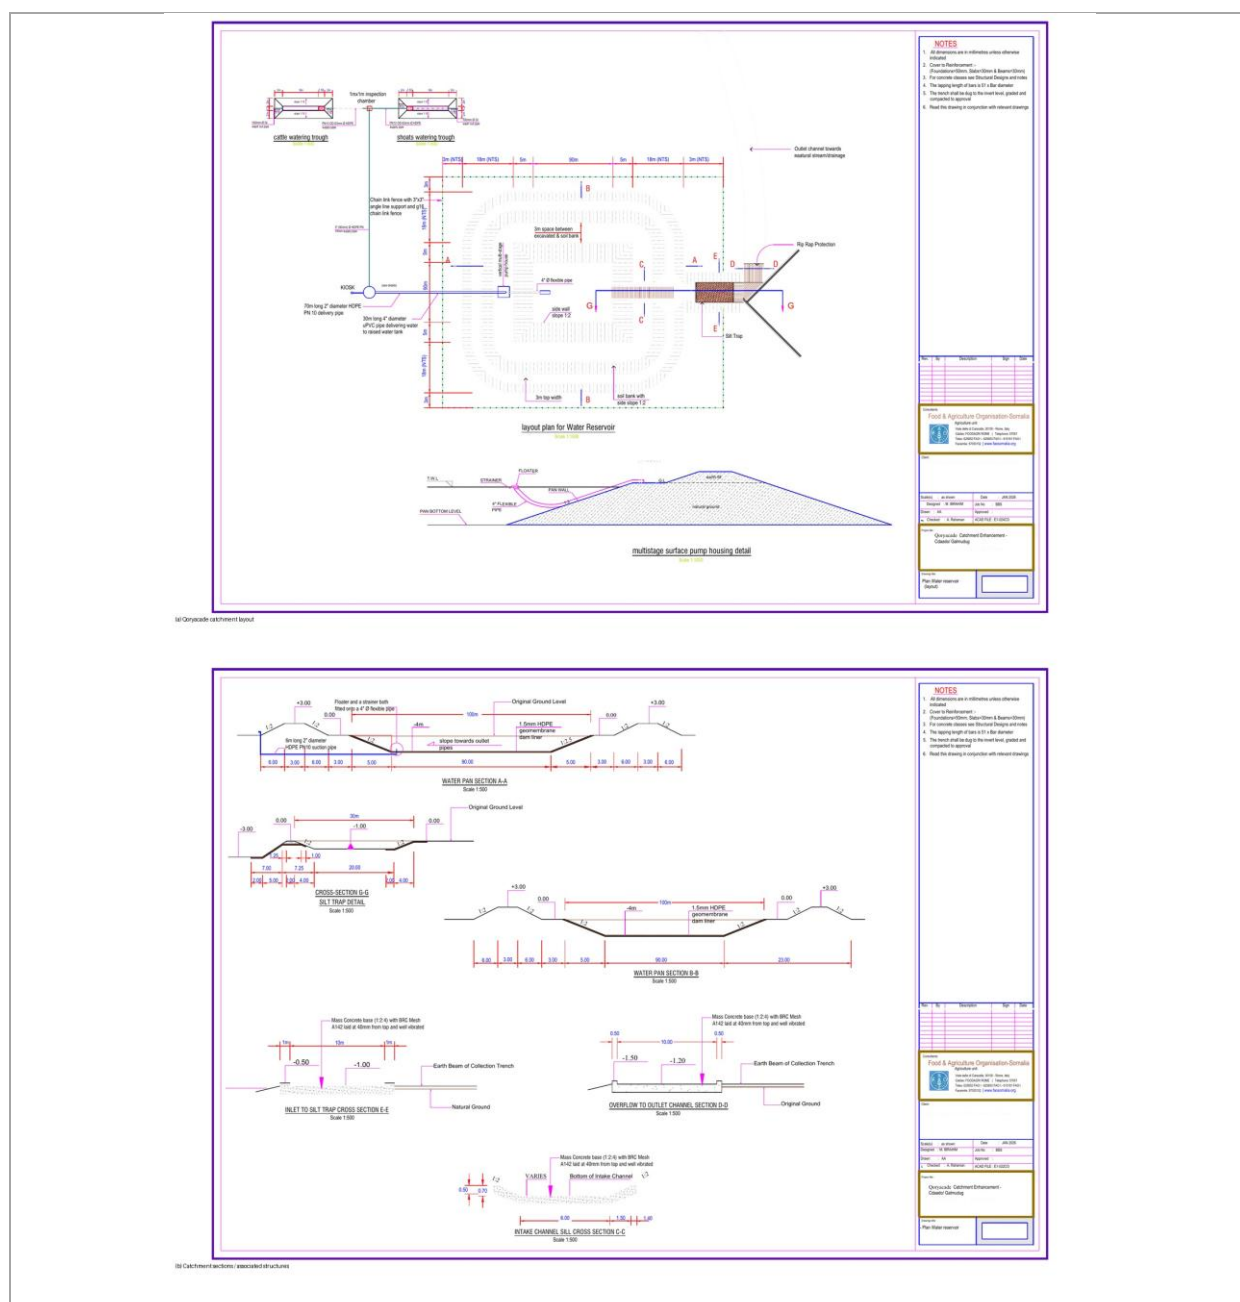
Qoryacade Water-Catchment Layout, Sections, Inlet/Silt Trap and Overflow Arrangement - Galmudug
